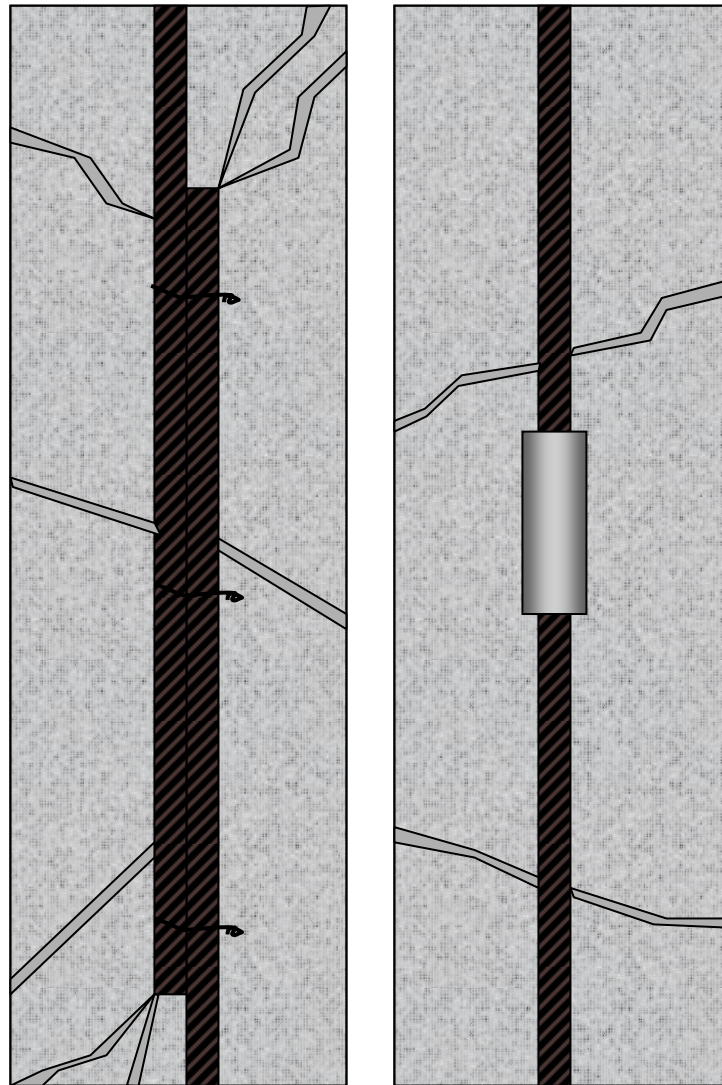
Typical reinforcing bar lap splice, on left, and generic reinforcing bar rebar coupler, on right. Both are shown in cracked concrete.
